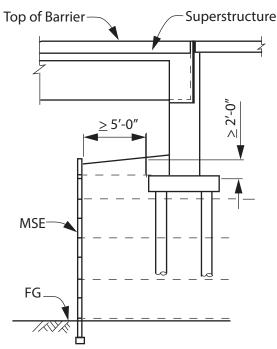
MSEA Type 2 - Pile Foundation (not to scale)
